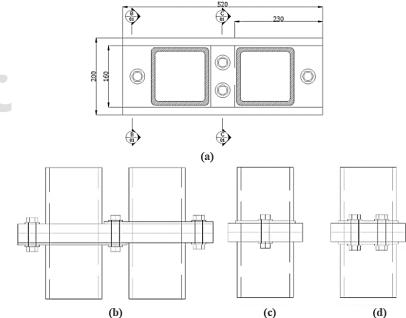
Detail of proposed module to module connection (a) top view, (b) front view and cross-sectional views (c) section B-B and (d) section C-C.
